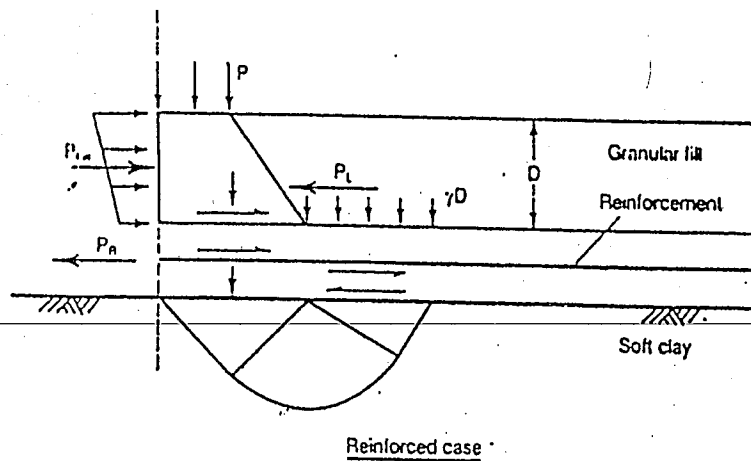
Mechanics of Reinforcement in Reinforced Foundation Beds
